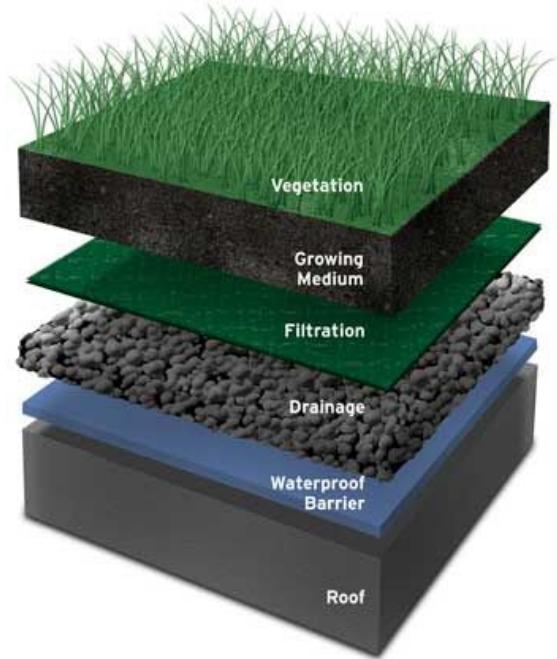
Our proposed Green Roof for the Training Facility
